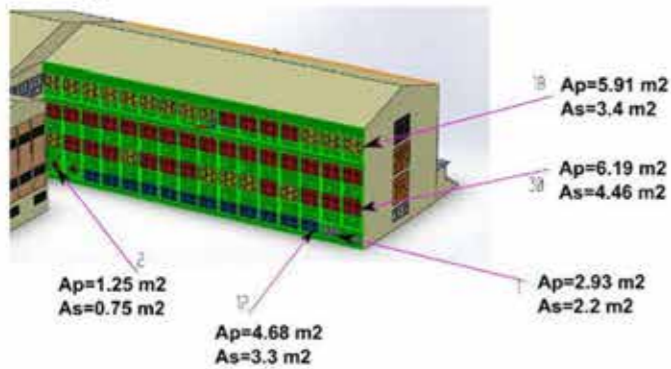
FTSB south façade – Total area without windows 398,8 m²; red colored windows are with double glazing and plastic carpentry; A_p – area of window; A_s – glass area of the window
